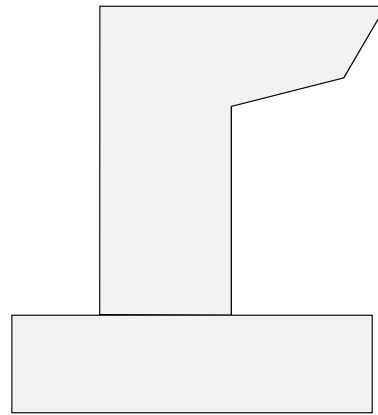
Example of Reinforced Concrete Cantilever Bent
